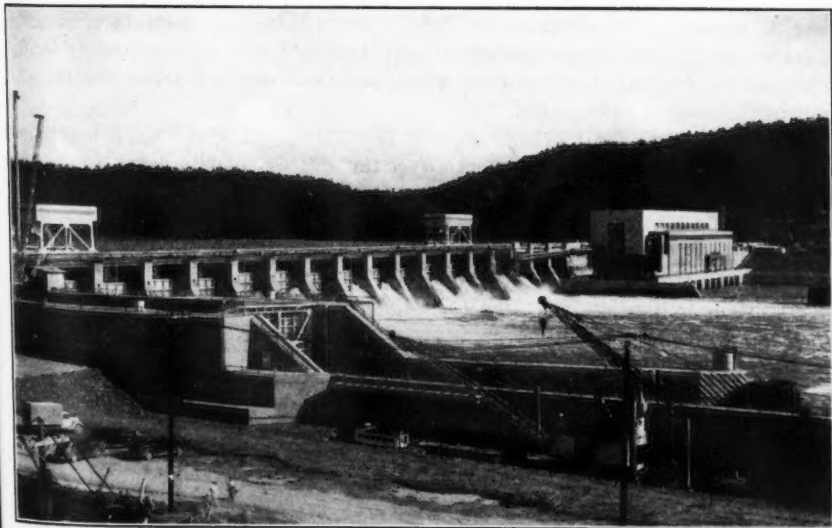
GUNTERSVILLE DAM, SHOWING LOCK, SPILLWAY, POWER HOUSE, AND SWITCHYARD
